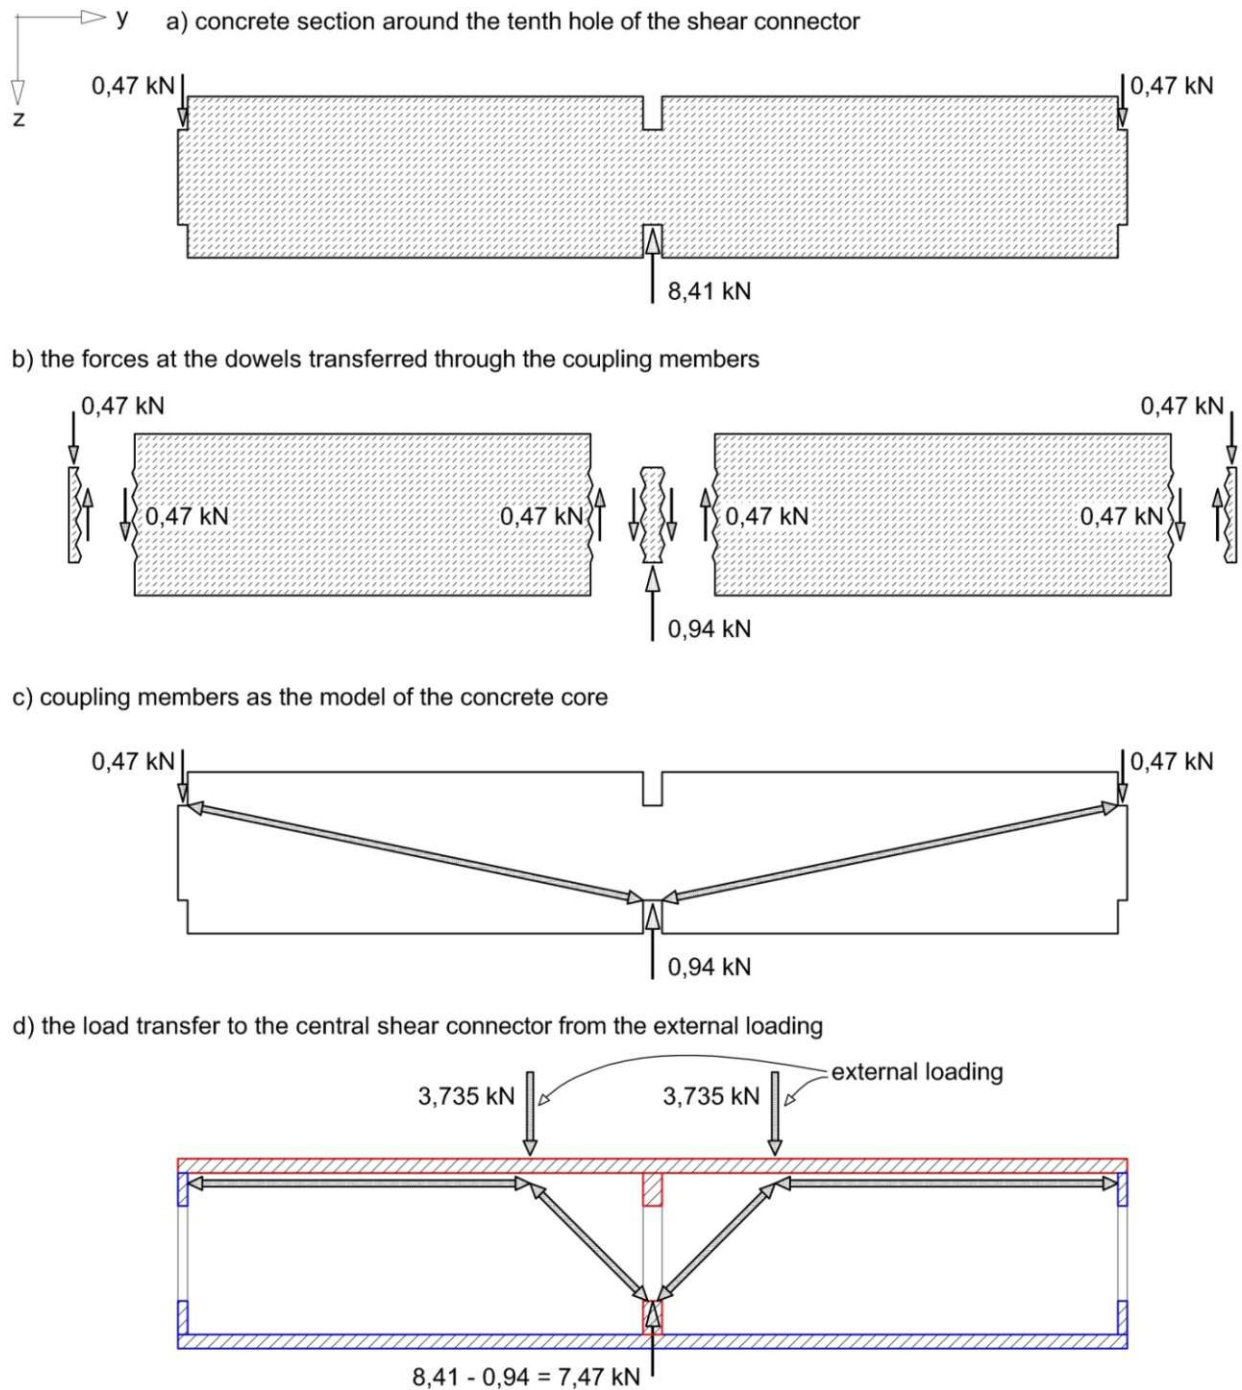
Analysis of the force transmission in the concrete at the tenth circular holes of the shear connectors: a) the concrete section with the loads at the composite connections; b) the concrete section with the forces transferred between the shear connectors (exploded view); c) concrete model with the coupling members; d) planar truss frame model to represent the load transfer to the central shear connector from the external loading
